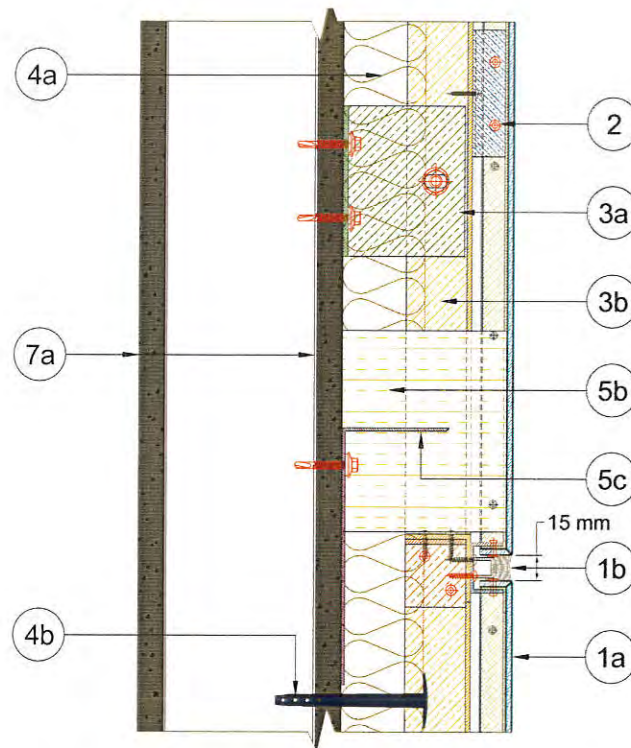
"Alstrong FR-B1" 4 mm thick Aluminium Composite Material Exterior Wall Cladding Assembly vertical section joint details
